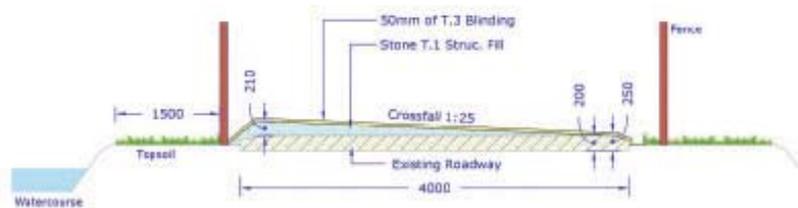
Farm Roadway resurfaced with T.1 Struc. fill and dust to a 1:25 crossfall away from stream
